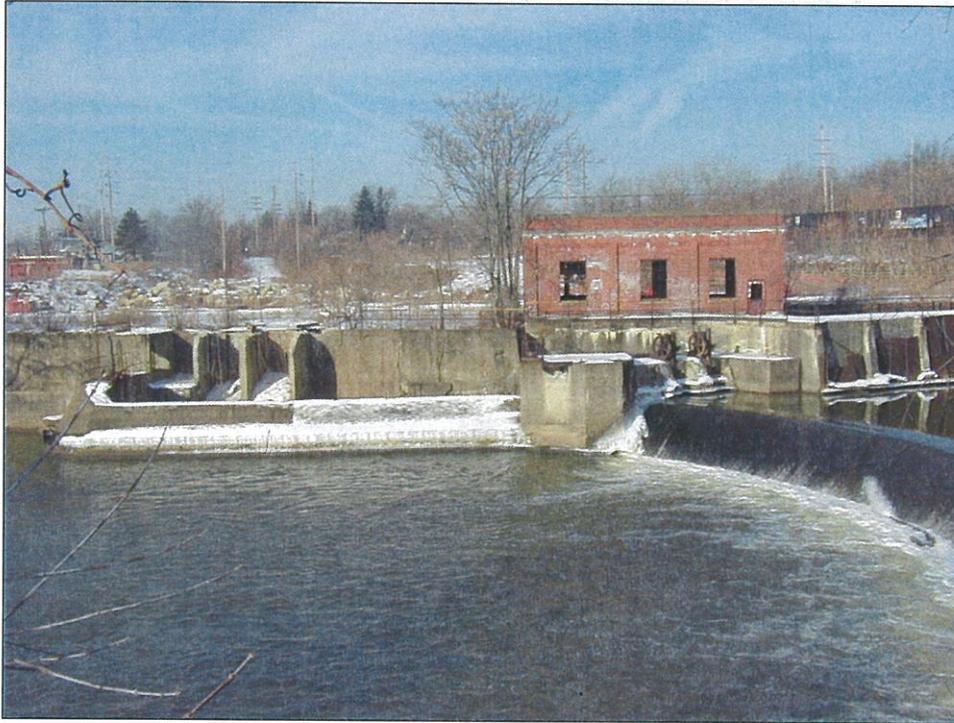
Warren Water Works Dam. View of spillway and screen house looking west.
